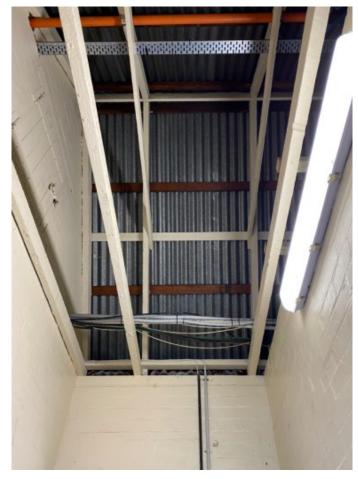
Open ceiling in room 2. Note timber access hatch at left (Gartner Rose)
